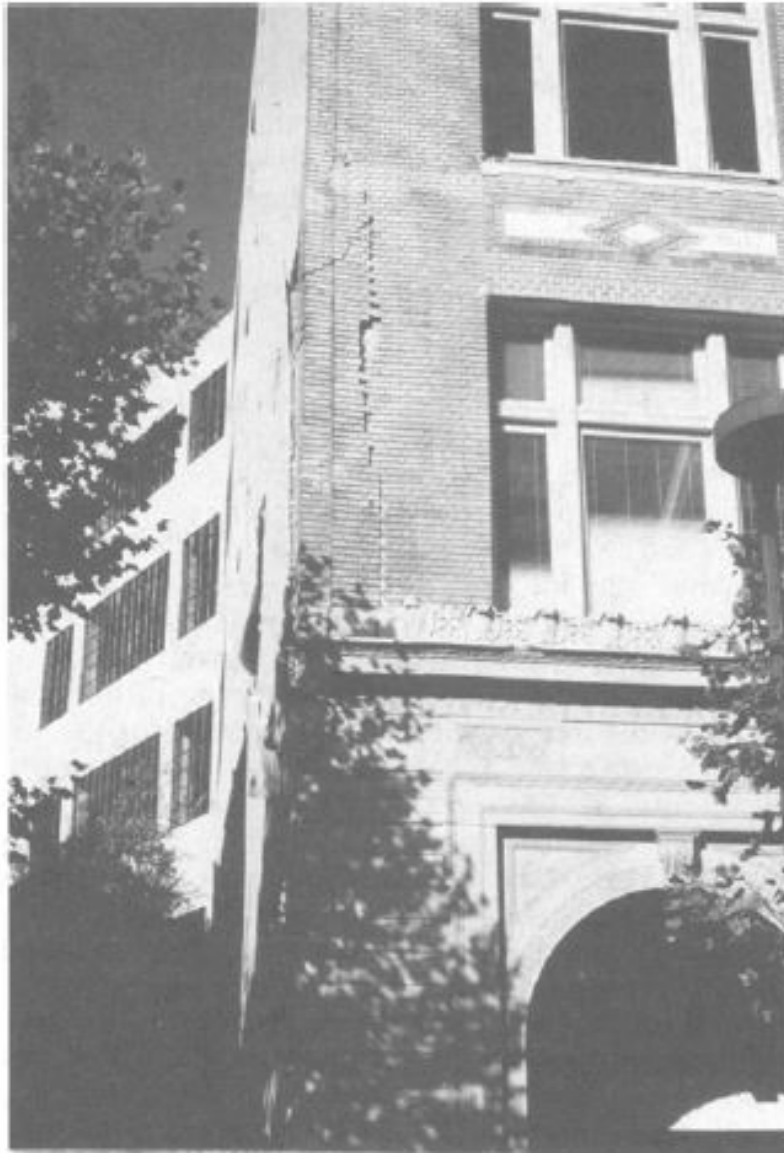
DIAPHRAGM-INDUCED CORNER DAMAGE TO URM PIER (OAKLAND, LOMA PRIETA EARTHQUAKE)
